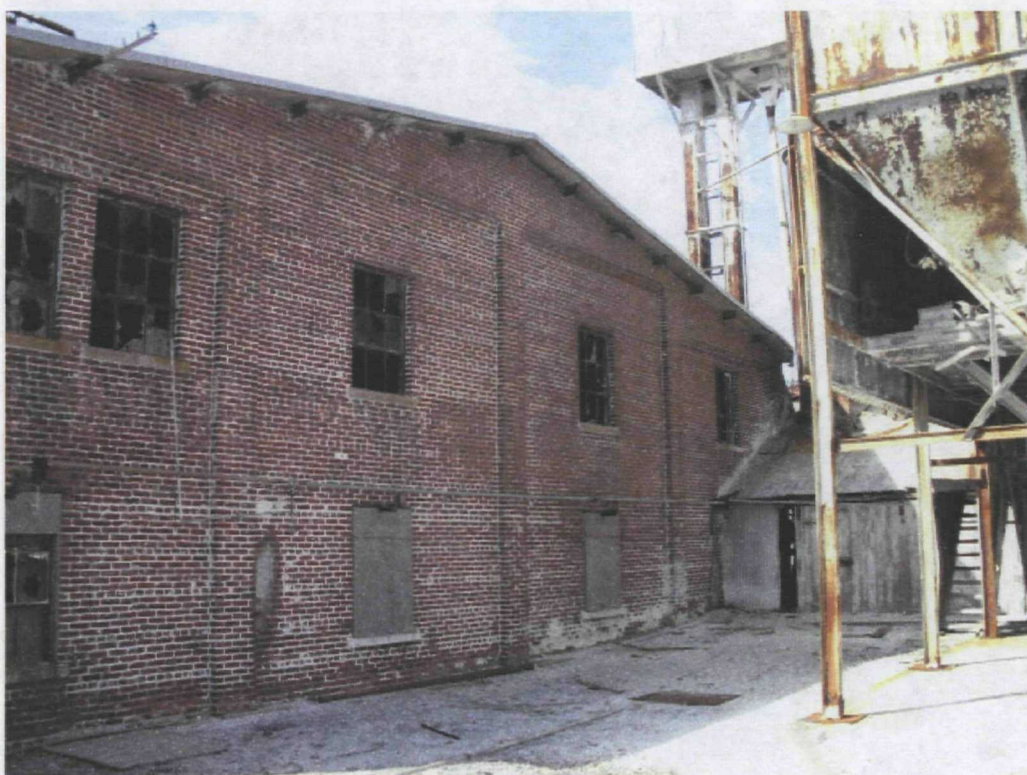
Exterior of north-west wing of Building D (looking south-west)
